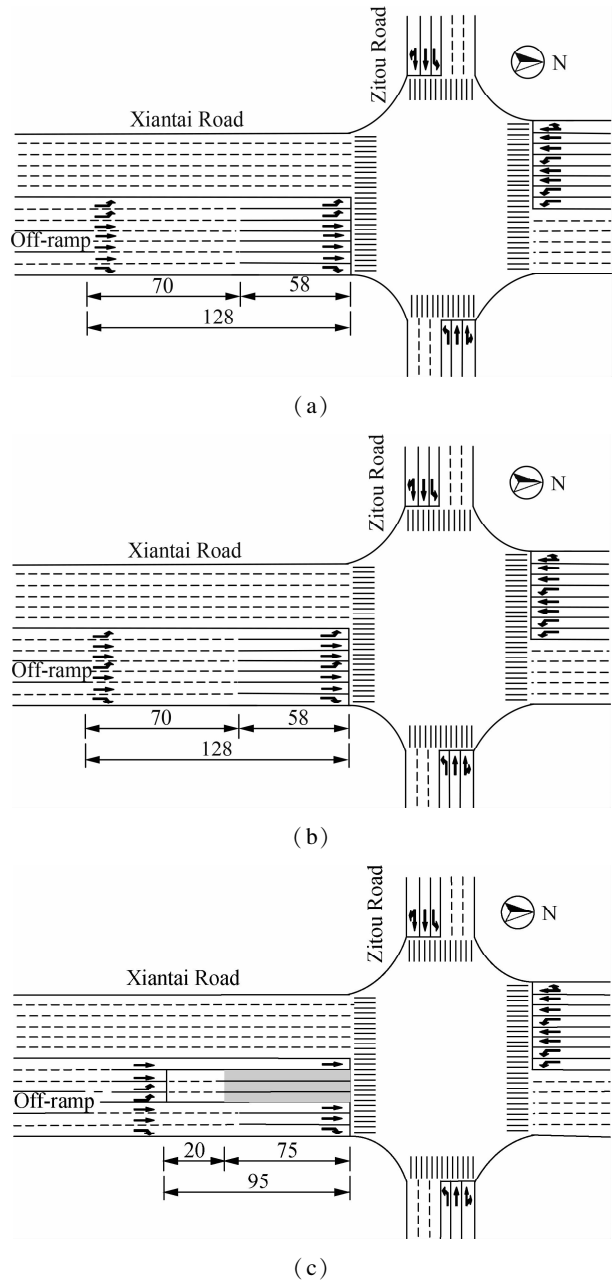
Layout design(unit:m). (a) Original layout; (b) Separate left-turn design layout; (c) Proposed layout
